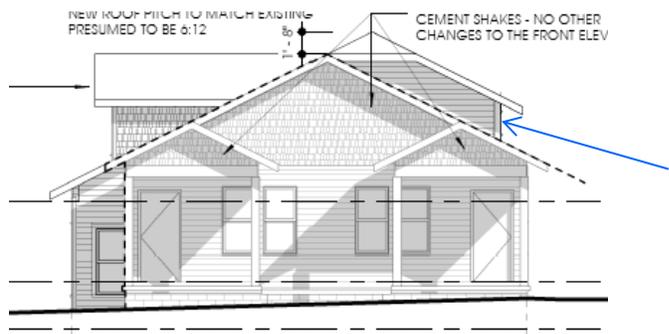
Front façade. Staff recommends pushing the right wall of the addition, (see arrow) in an additional two feet (2') to reduce the massing.
